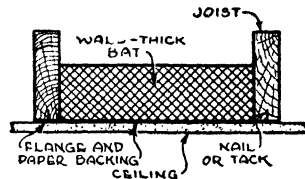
Application of Wall-Thick Flanged Bats Between Ceiling Joists; Bats Are Installed before Ceiling Is Applied
